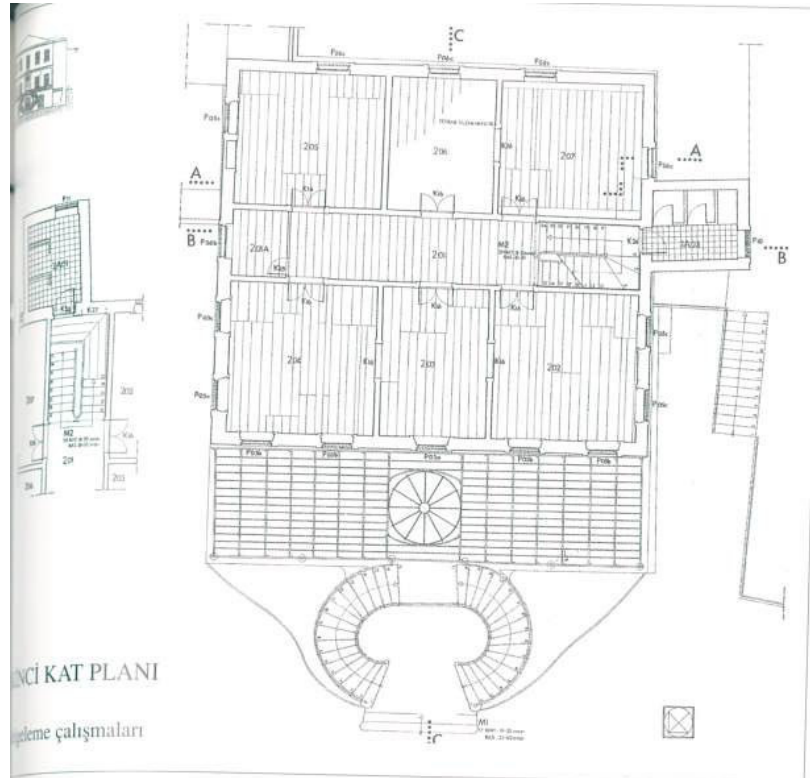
First floor plan of Latife Hanım House in Köprü.
